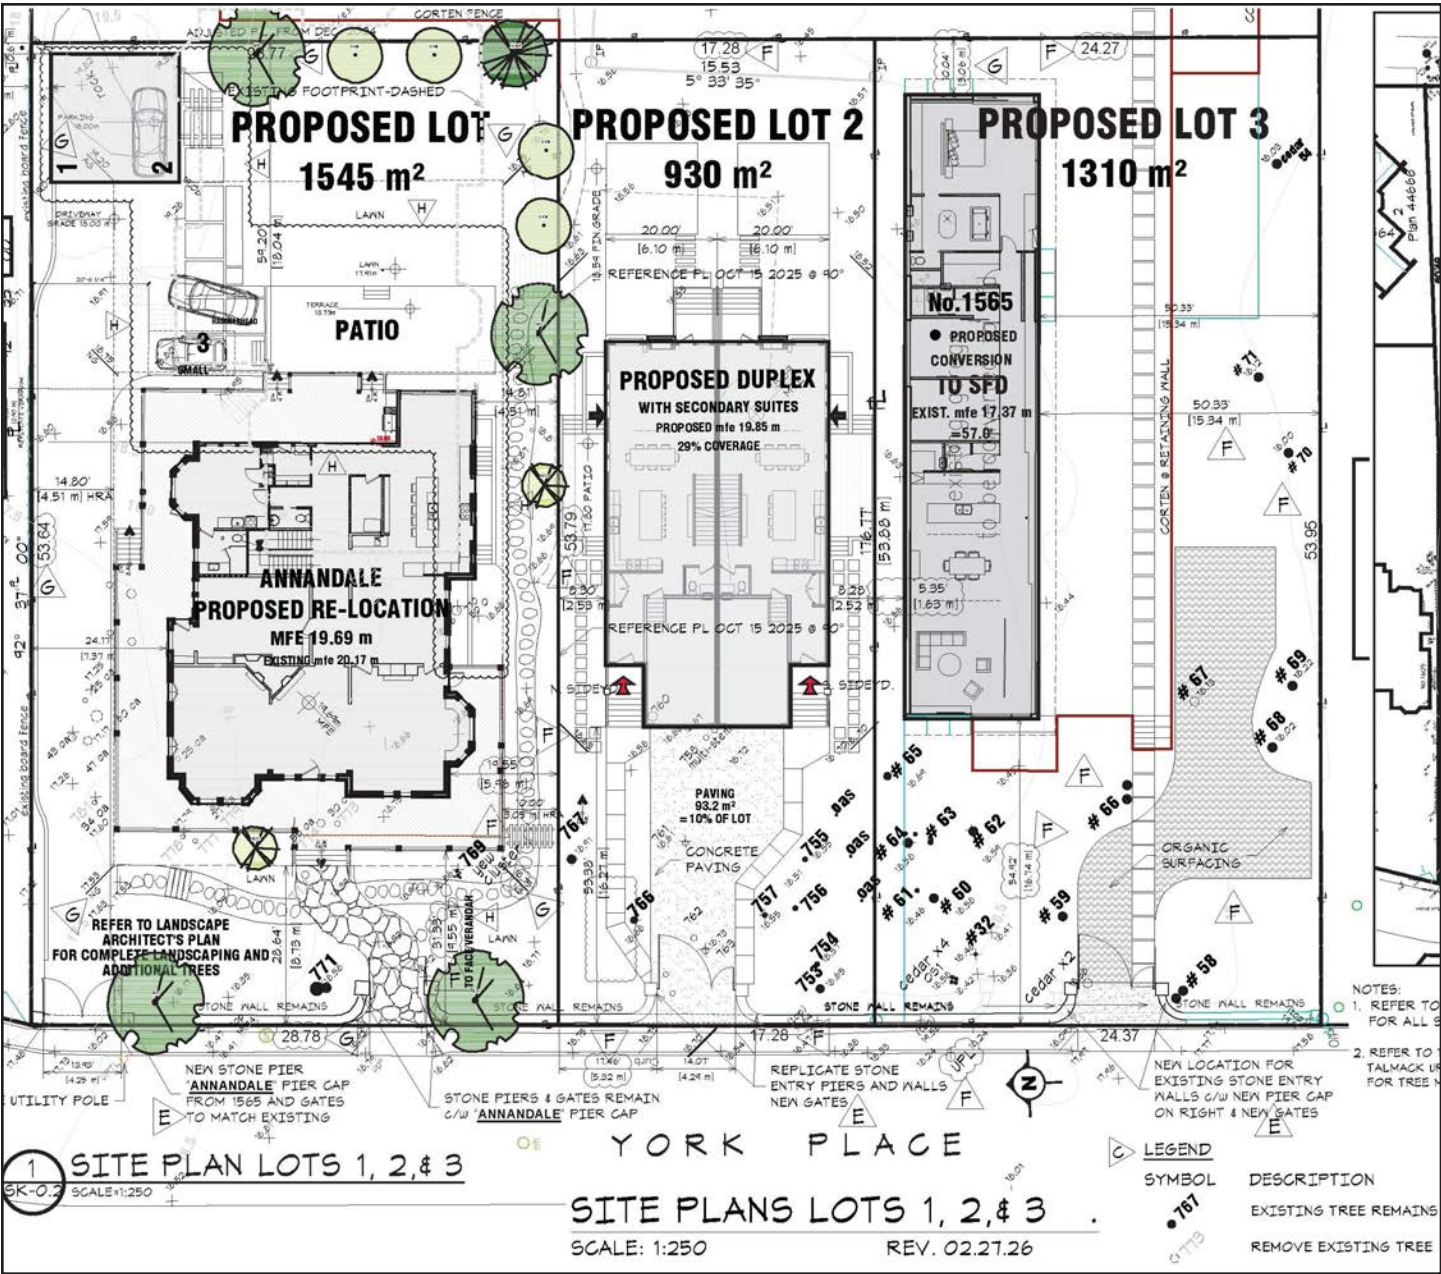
Site plan of the revitalized site showing the reoriented Annandale and the subdivided lots. (Source: Zebra Design)
